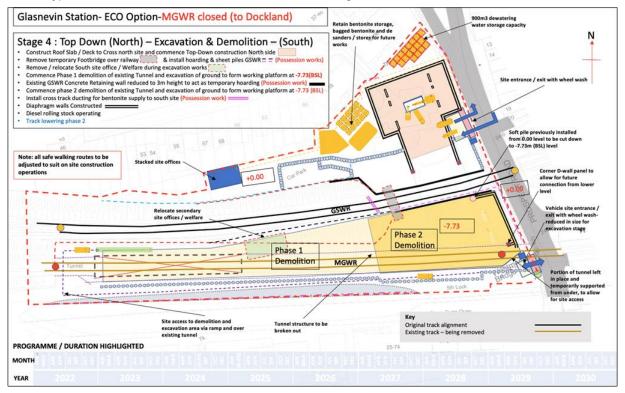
Top- down (North) and Phased Excavation and Tunnel Demolition (South)
